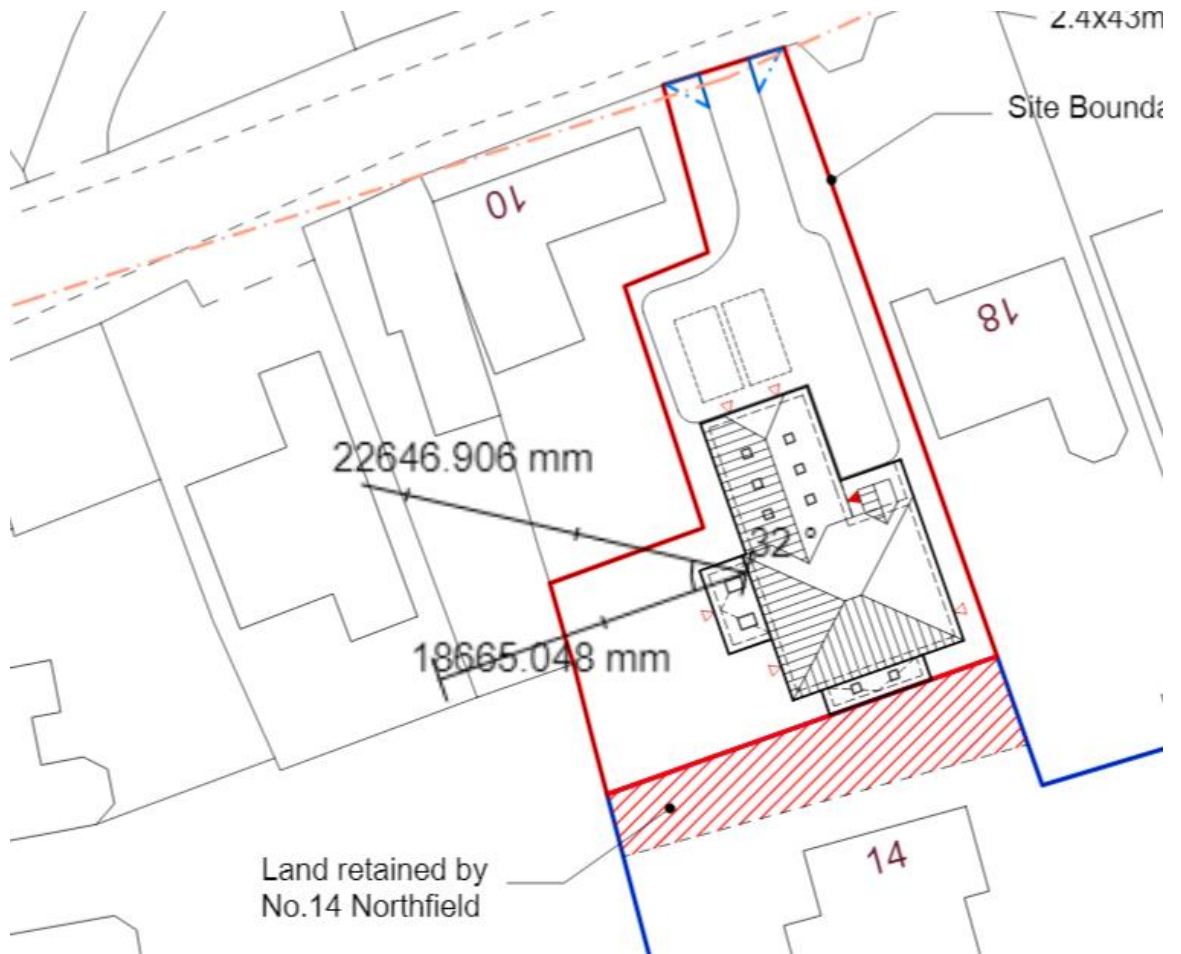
Distances between first floor windows of No6 Birkinstyle Lane and the application property
